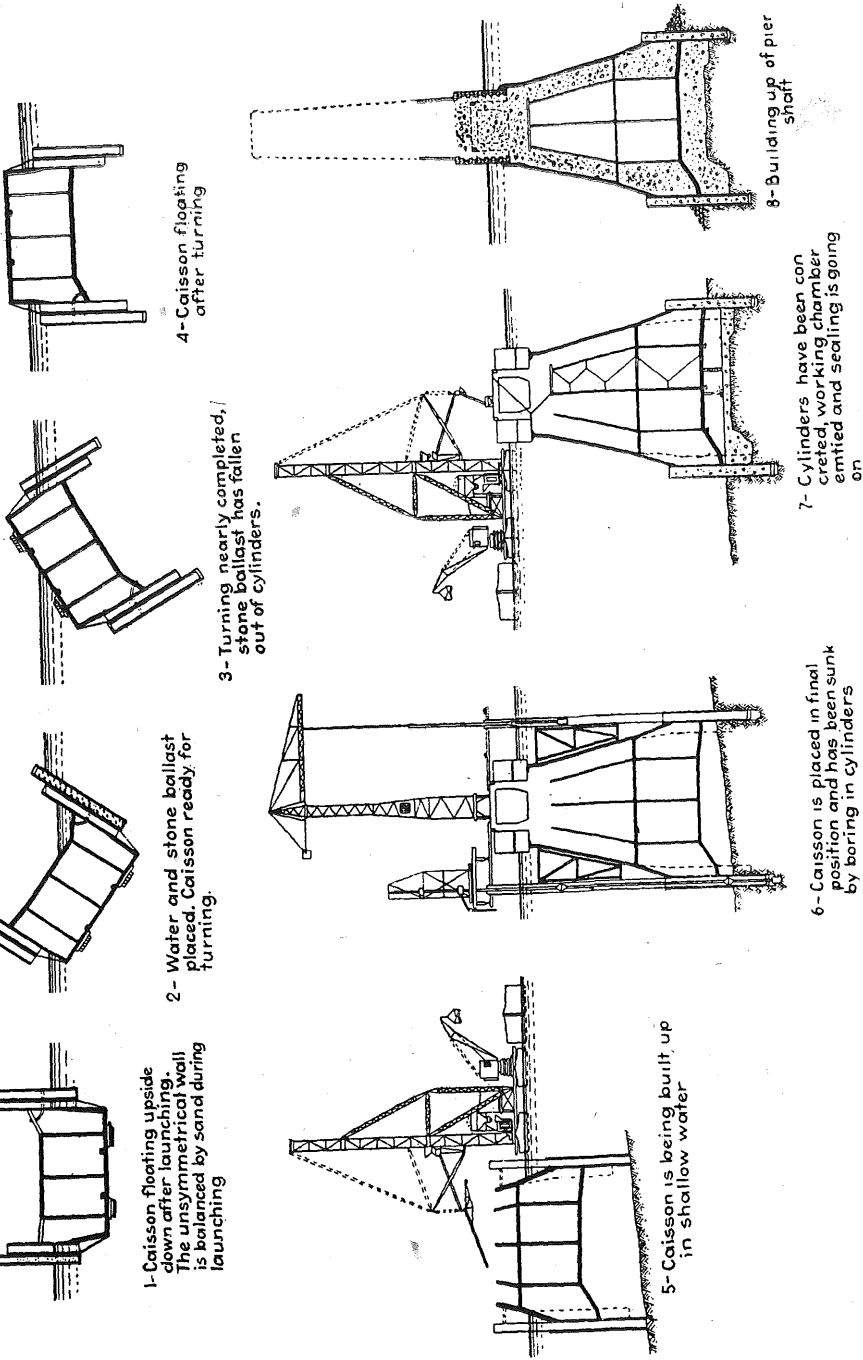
METHOD OF LAUNCHING CAISSONS IN AN INVERTED POSITION AND OVERTURNING BEFORE SINKING.
